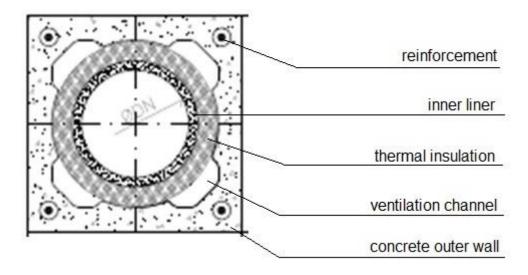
Example of outer wall as storey height unit with reinforcement
